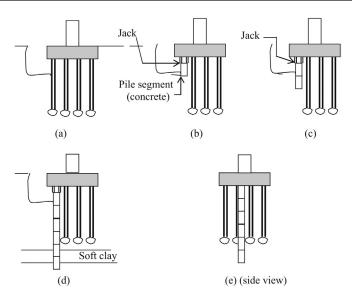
Bringing the building back to the original position. (a) An approach pit was constructed as shown. (b) Concrete pile segment was placed and jack was assembled on top of the pile. (c) Concrete pile segment was jacked down using the pile cap above. The engineer had to make sure that the pile cap would be able to resist the load due to jacking. Usually, piles are jacked down one at a time. At any given time only one pile was jacked. (d) The pile segments are jacked down below the soft soil layer. (e) The new pile segments were jacked down between the existing piles without damaging the existing piles. Side view of a jacked down pile is shown in Fig. 12.10.
